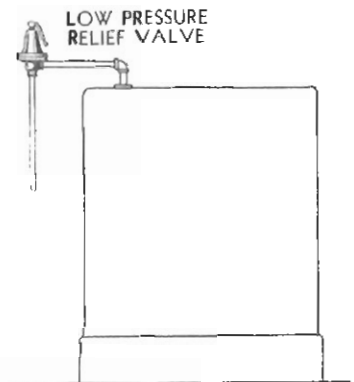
Low Pressure Relief Valve installed on hot water boiler.
